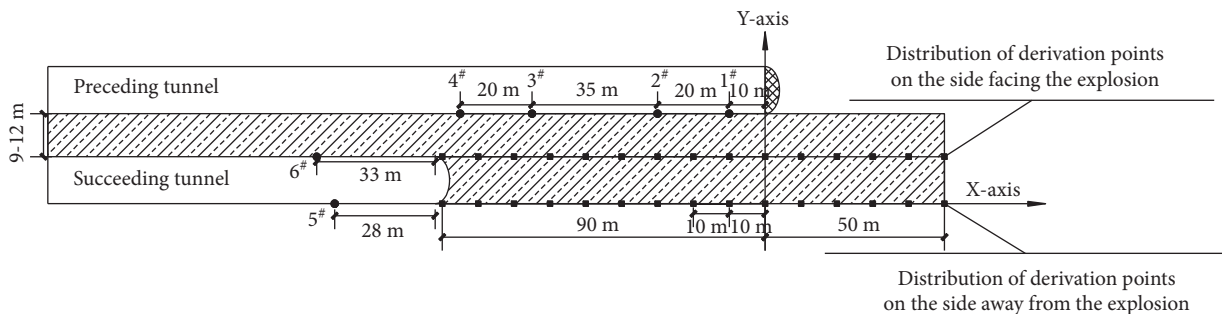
Schematic diagram of the layout of monitoring points and proposed points for tunnel blasting vibration.
